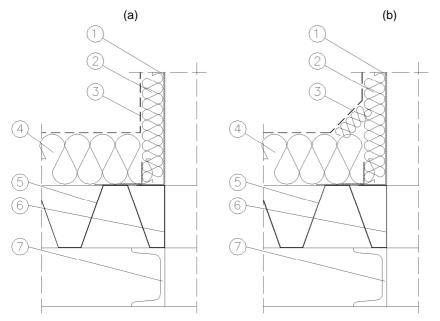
Steel base on steel structure: (a) membrane work; (b) felt work.
